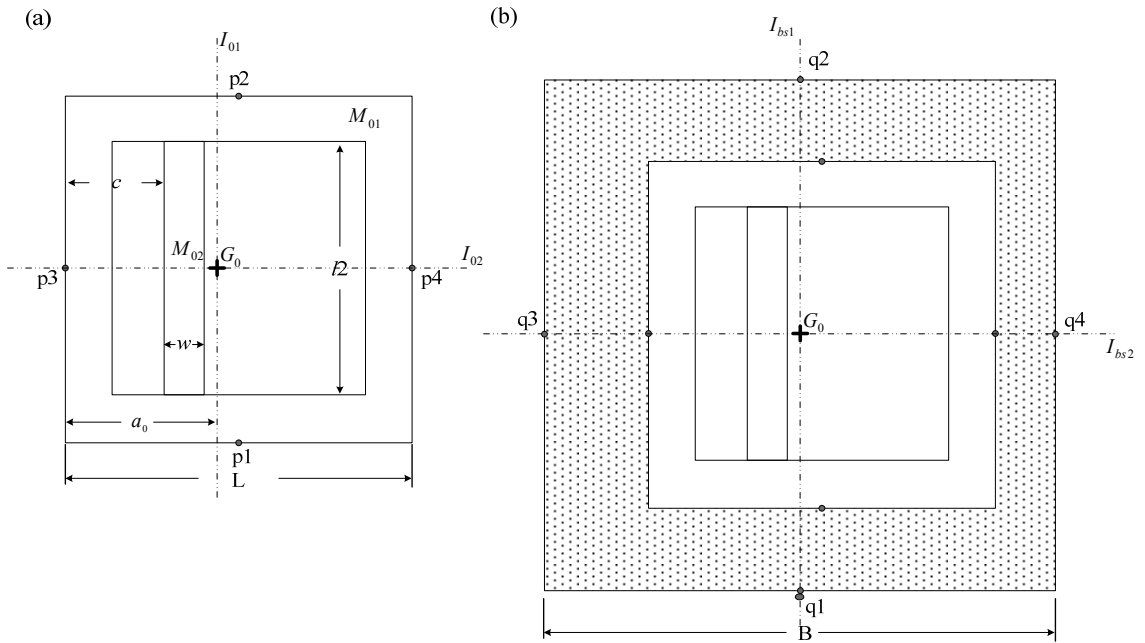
(a) Plan view of the structure and dimension parameters of the uneven-mass machine. (b) plan view of the balanced setting with the inertia block.
